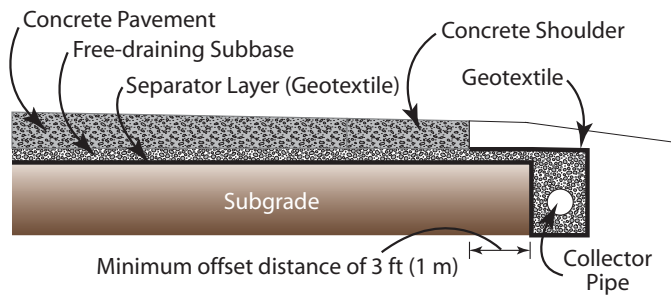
Detail for edge drain piping. Note that the filter fabric (geotextile) does not completely surround the trench, which prevents the fabric from being clogged by leachates or other fine particles carried by water flowing through the subbase, and the drain is offset at least 3 ft (1 m) from the edge of paving whenever possible, which protects it from construction traffic.
